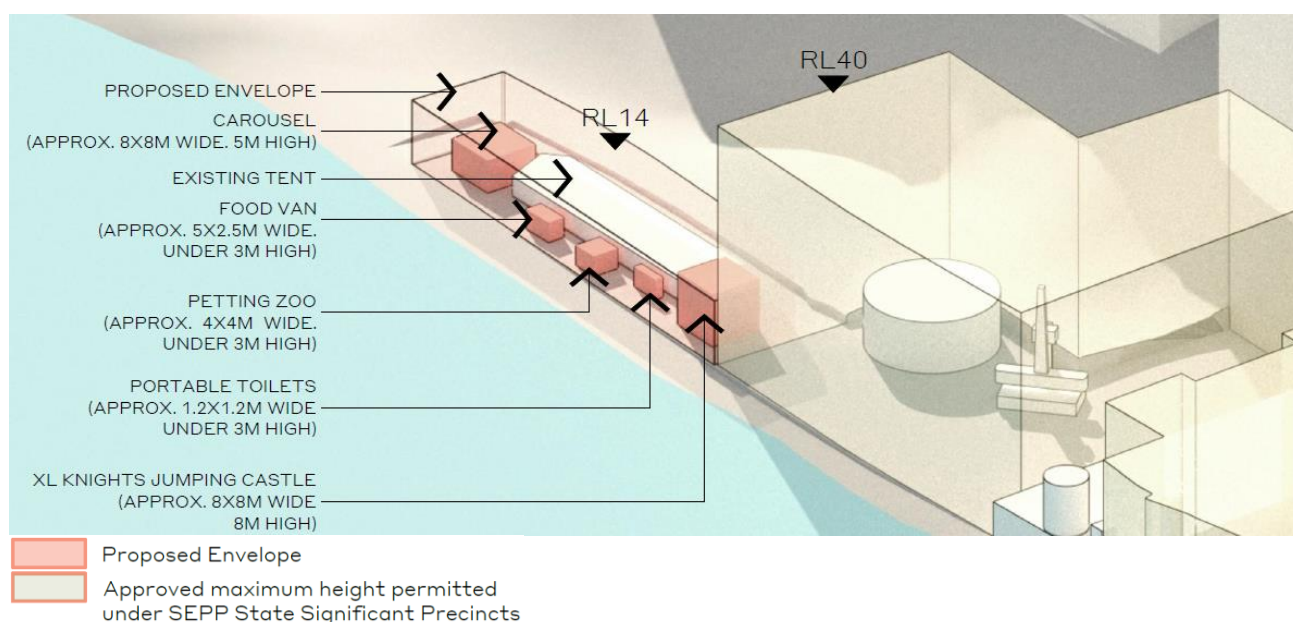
Proposed building envelope relative to the approved maximum height of rides across the remainder of Luna Park
